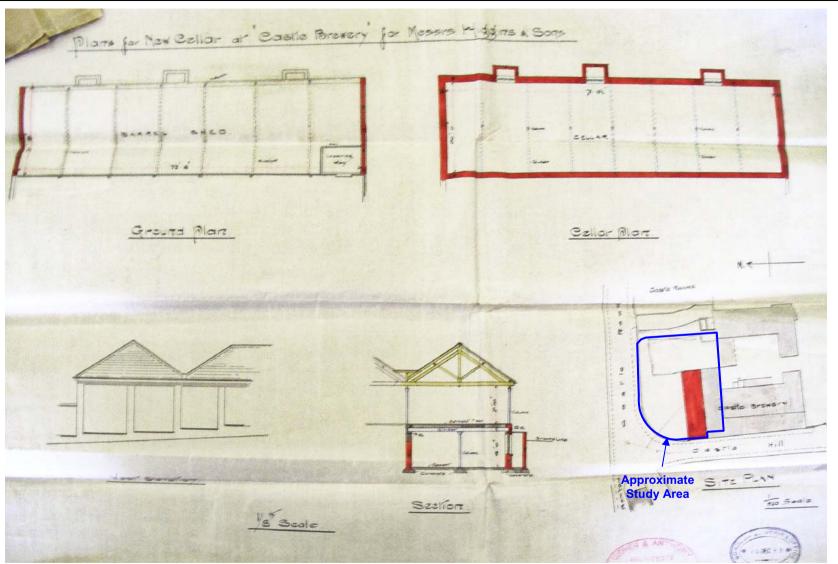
Building plan: new cellar. 1899 (Not to scale)
